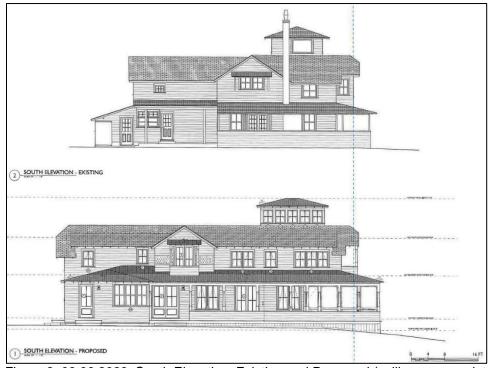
03.06.2023, South Elevation, Existing and Proposed (sullivan + associates architects).
